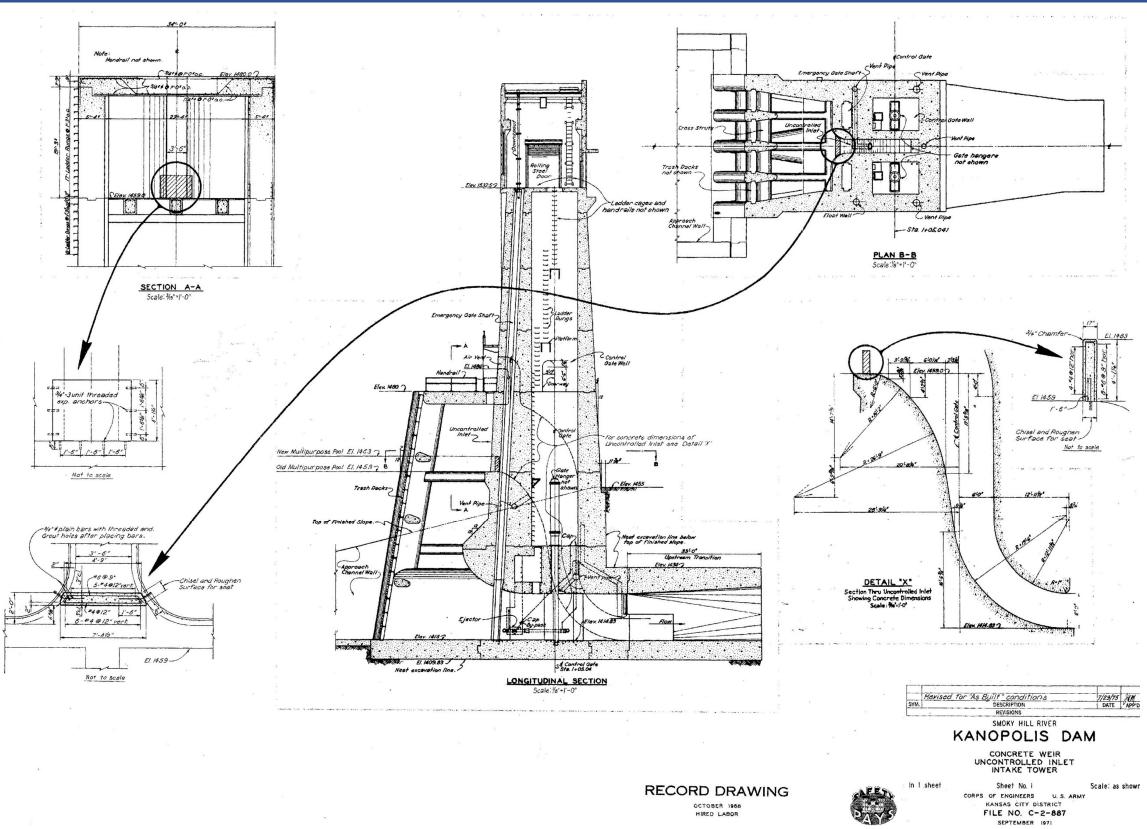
Concrete Weir Uncontrolled Inlet. Elevations in NVGD29.
